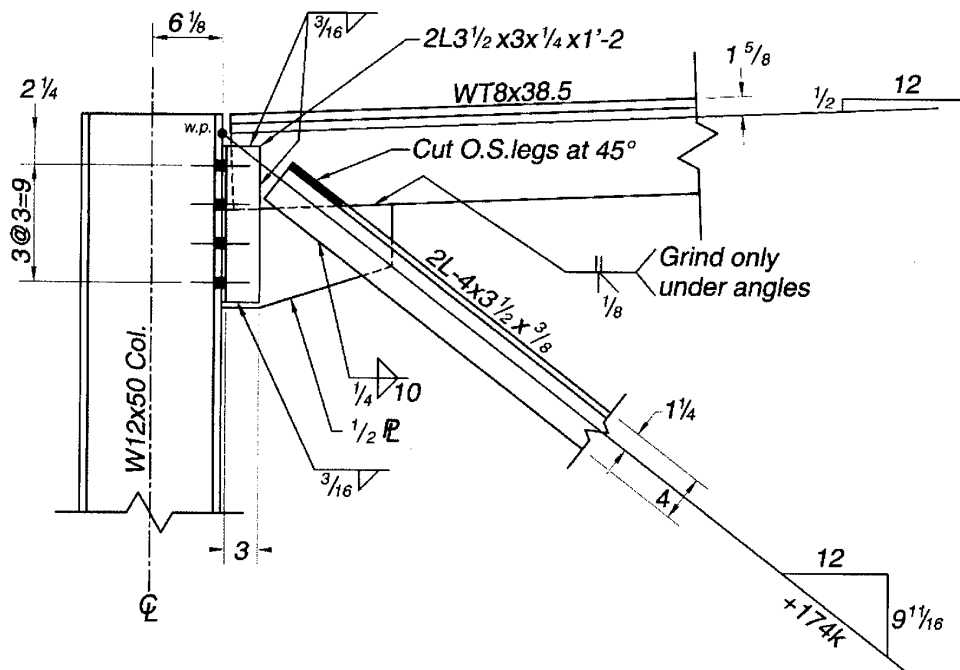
Truss support connection, working point (w.p.) on column face.
